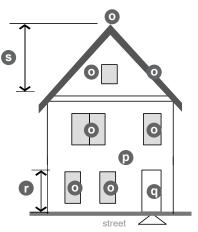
(3). Single Family Building: Street Facade Requirements
